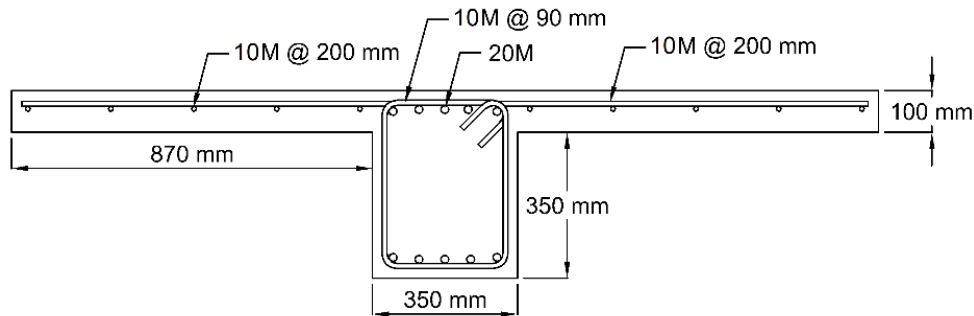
Dimensions of specimens with slab (dimensions in mm)
